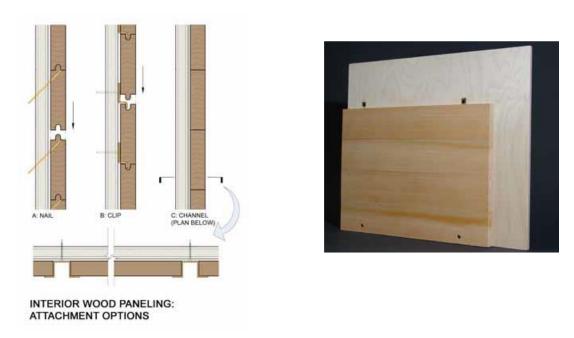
Interior wooden panelling joints; plan and section with site illustration 135
